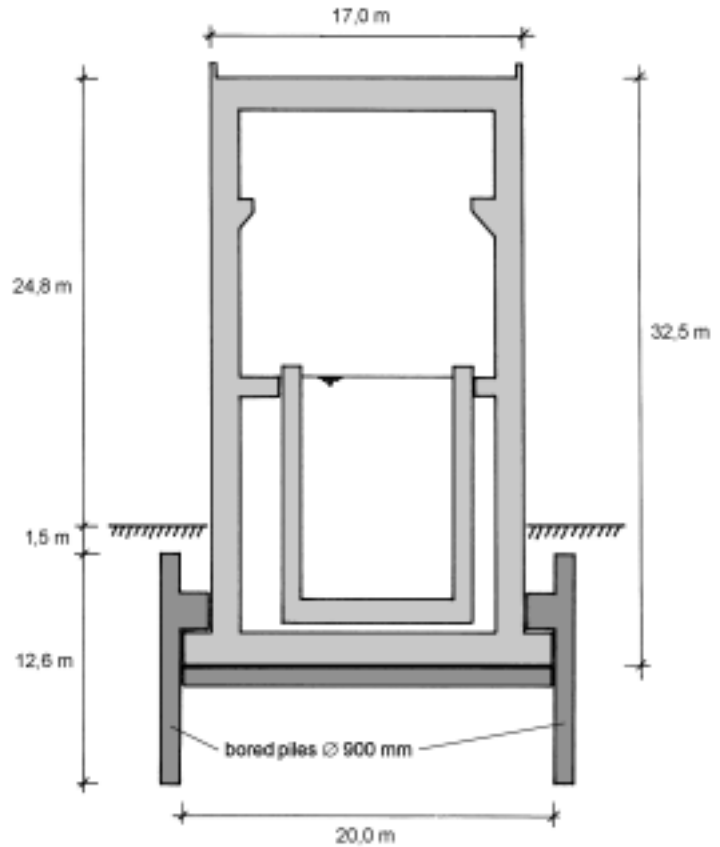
Cross section through the new KKG spent fuel pool building (SFPB)
